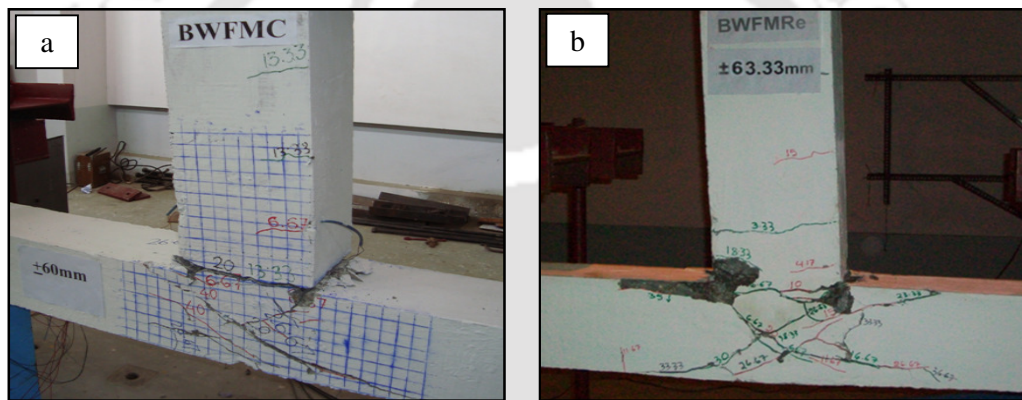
BWFM specimens at the end of test under loading type-1:
